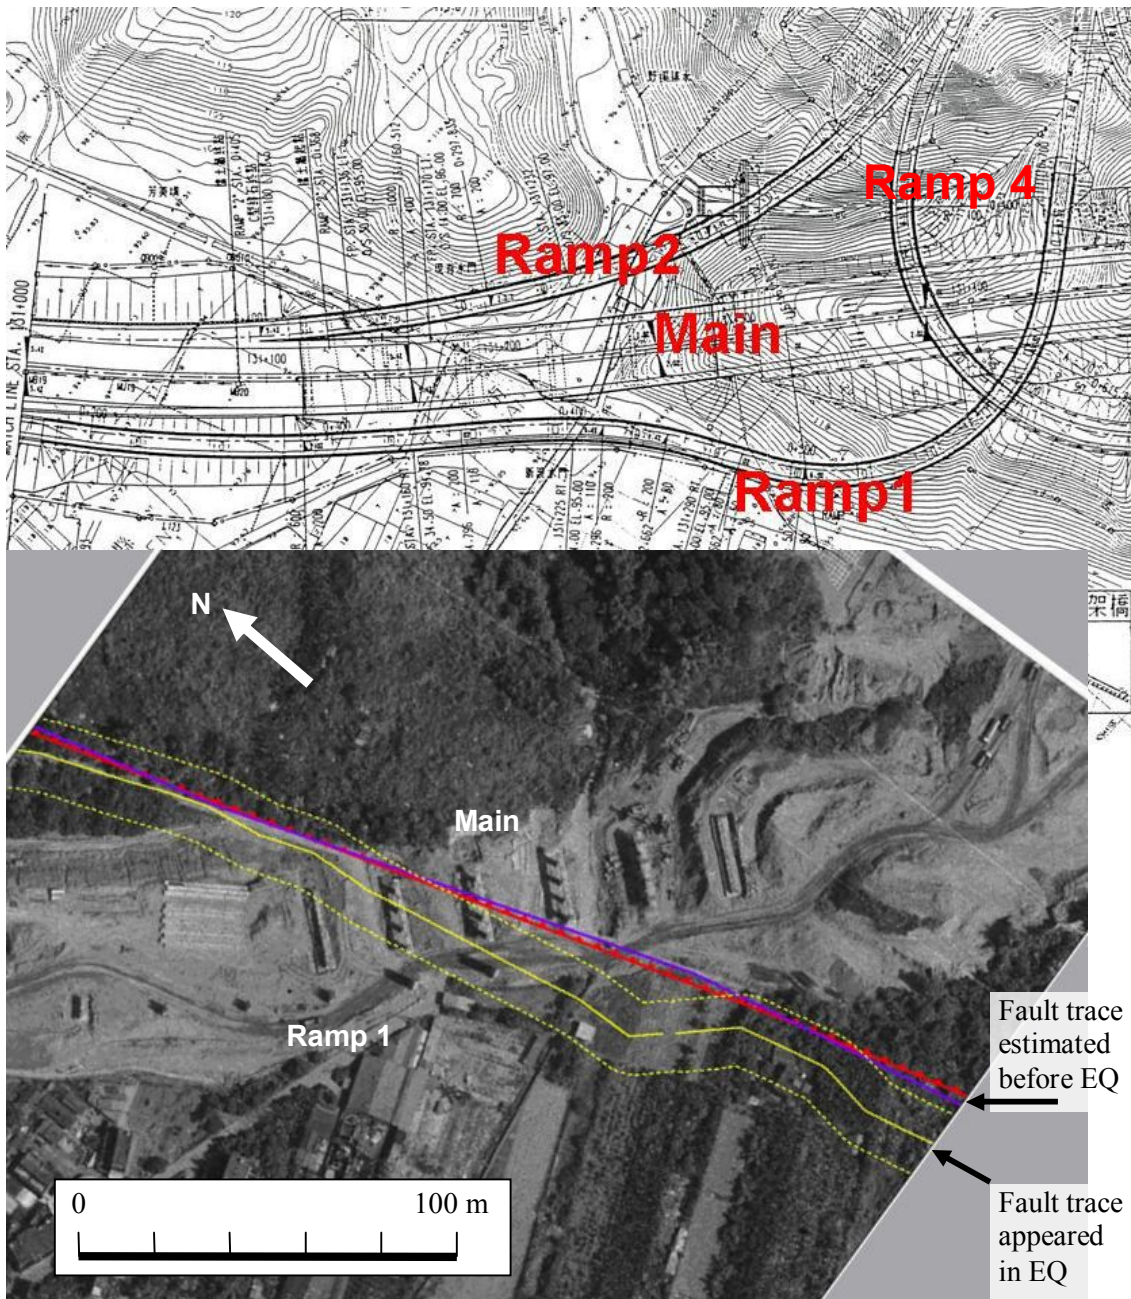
Original plan for Bauweishan viaducts (above) and aerial photo of the same area (below): When the earthquake occurred, all pile caps for the main viaduct and 5 for Ramp #1 from the north (left in the photo) supported piers.
